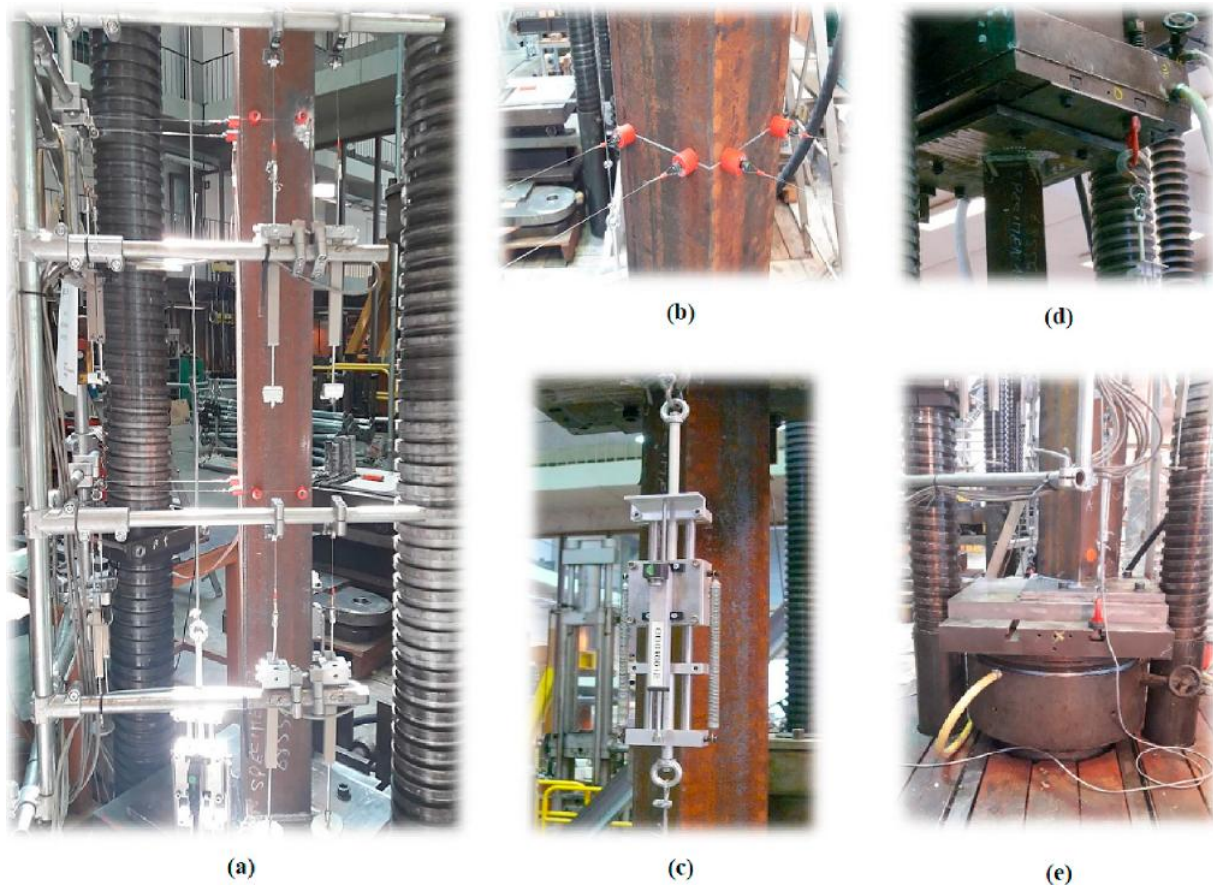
(a) General view of test rig with the measurement devices, (b) connection points of displacement transducers on the cross-section, (c) vertical displacement transducer, (d) detail of the top bearing plate and (e) detail of the bottom bearing plate.
